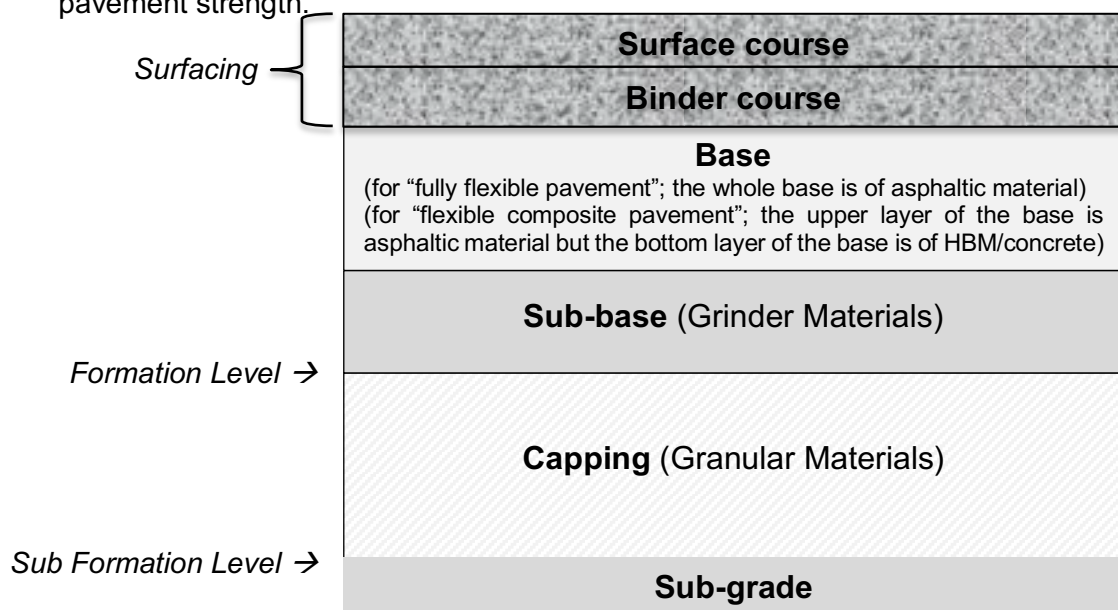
Cross-section of flexible pavement (Source: modified from Ali, 2016)
